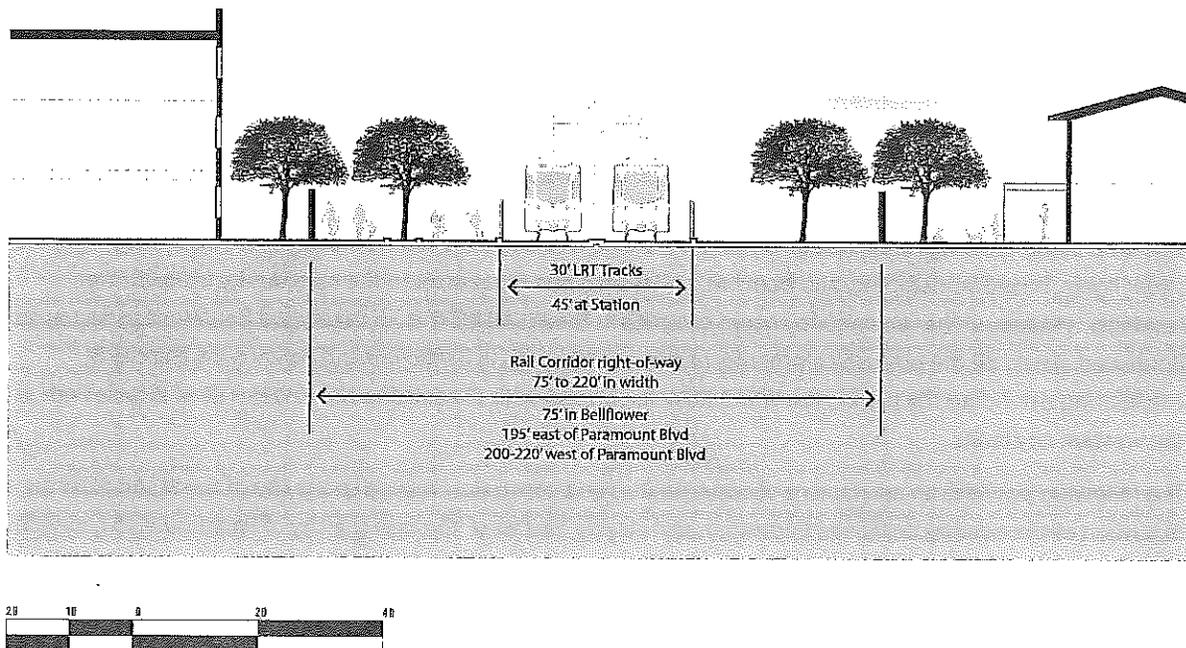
West Santa Ana Branch Light Rail Cross Section
